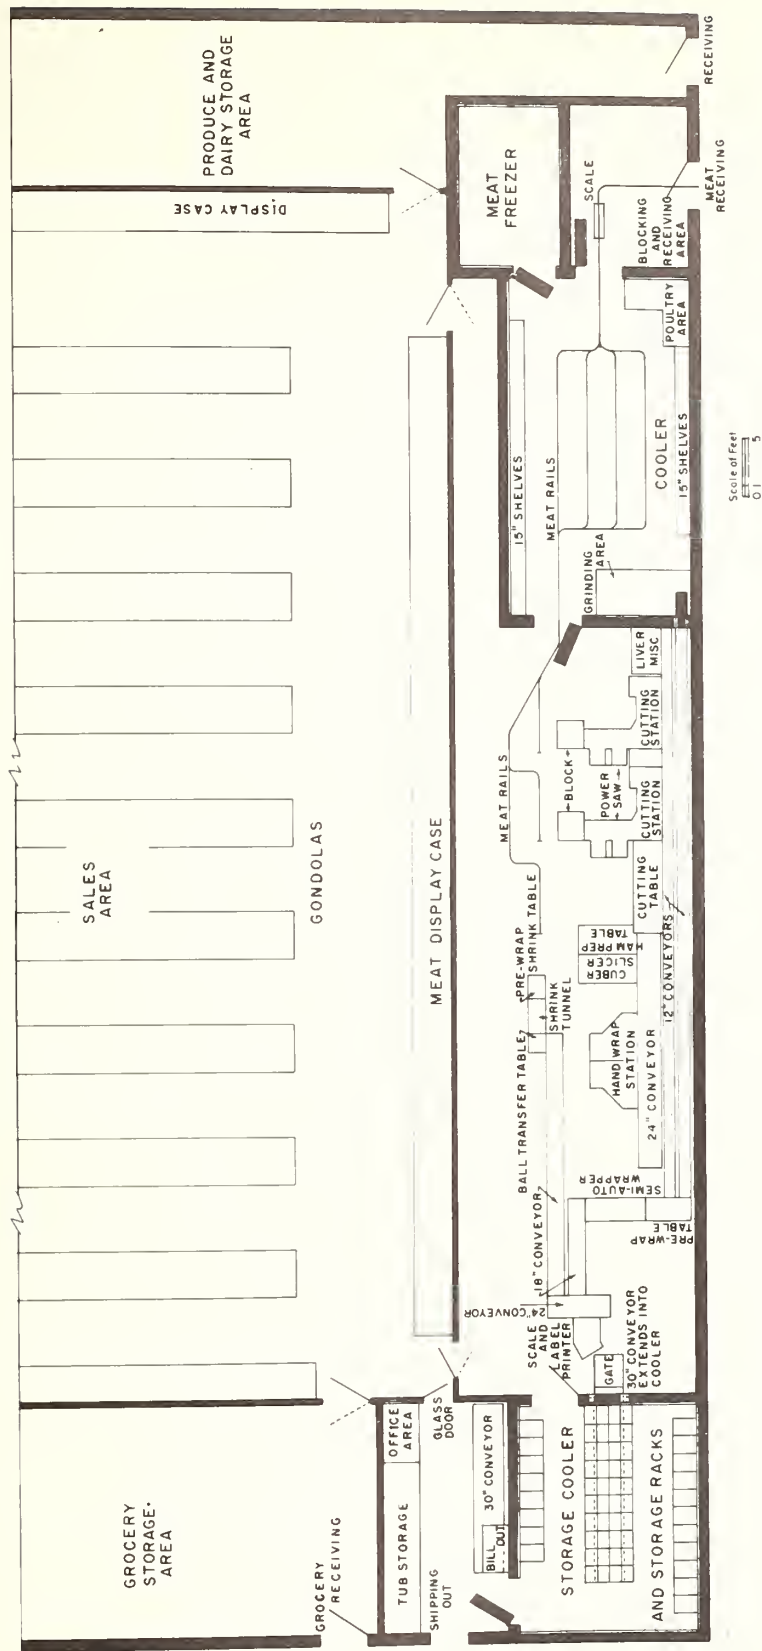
A small-volume central meat-packaging plant built in conjunction with a retail store.
